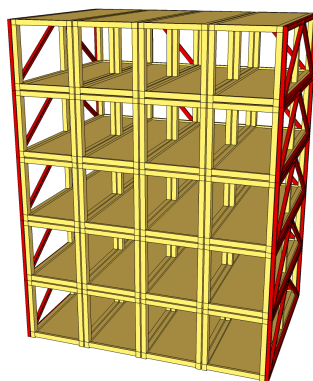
Case study building of a timber modular building comprised of a single stand alone building section
